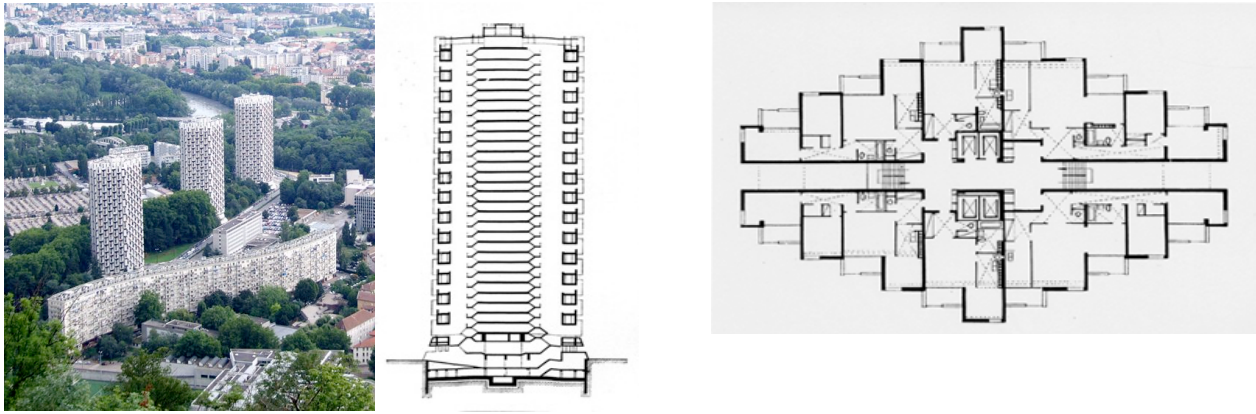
Left: The Ile Verte twin towers of Grenoble city. Belledonne and Montblanc towers are the two towers at the background of the picture. Right: elevation and plan view of the Belledonne tower.
